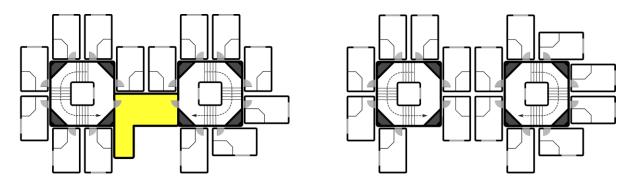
Floor plan at bridge deck levels of Nakagin Tower
